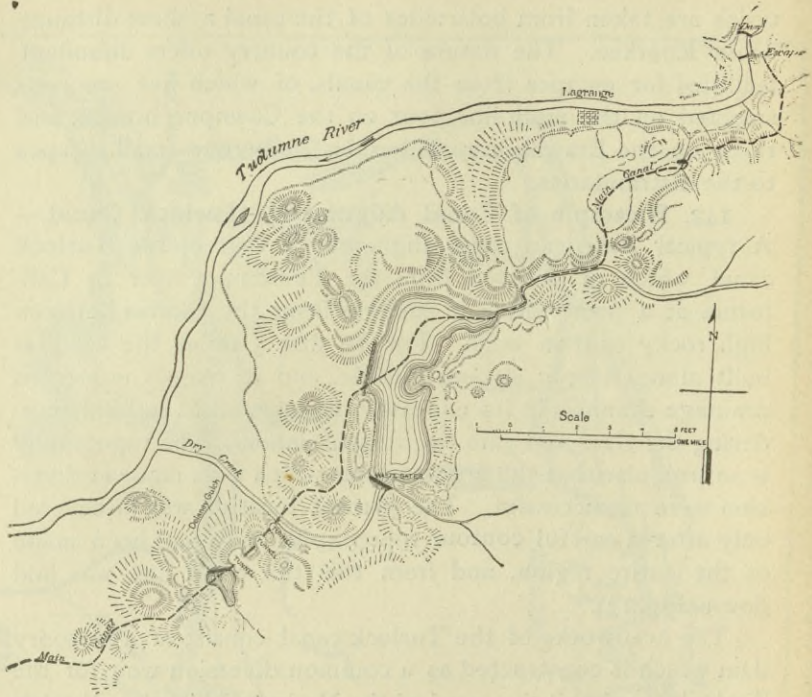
TURLOCK CANAL. PLAN OF DIVERSION LINE.
